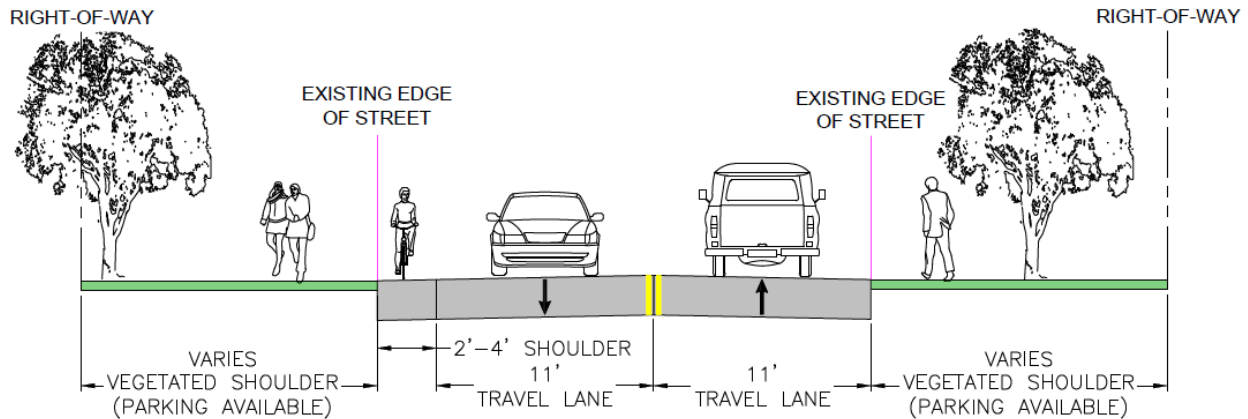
Coleman Avenue Existing Cross Section (Menlo Oaks) Looking East Toward Willow Road
